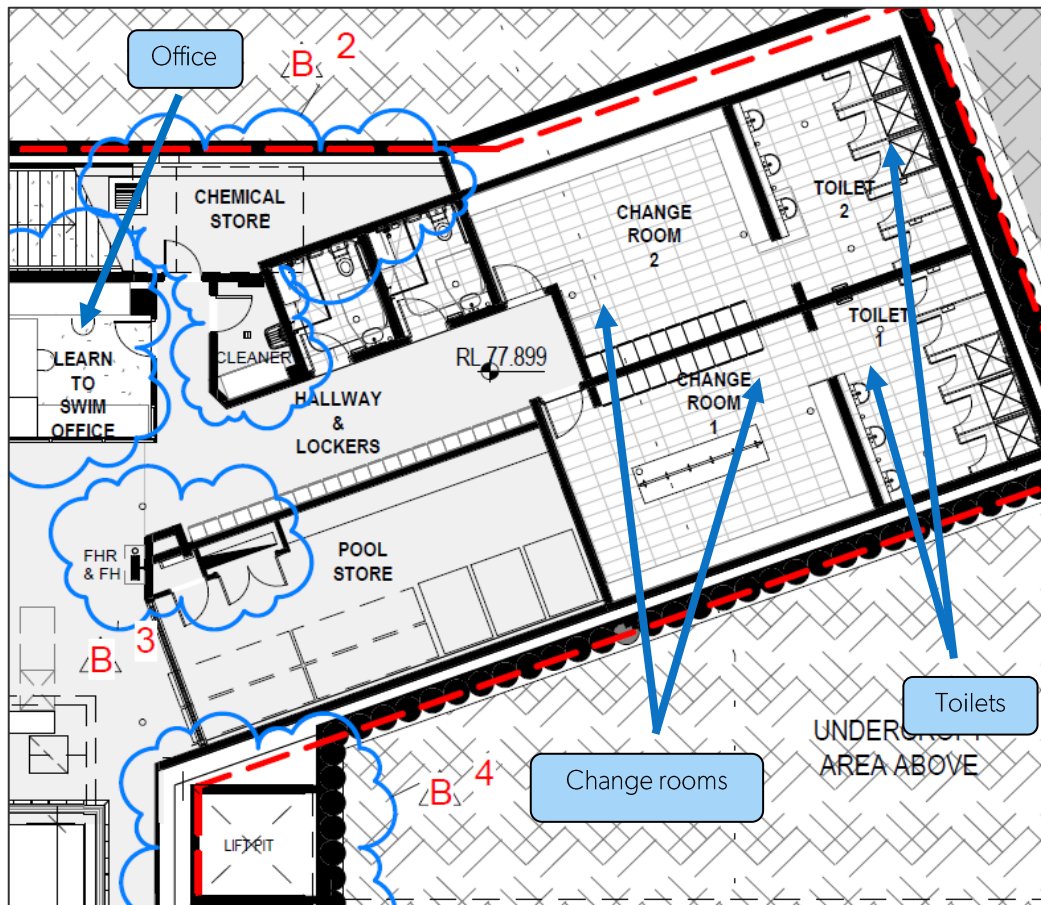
Approved RPAC floor plan level 2 (MOD1) (Source: Applicant's Modification Application 2017)
